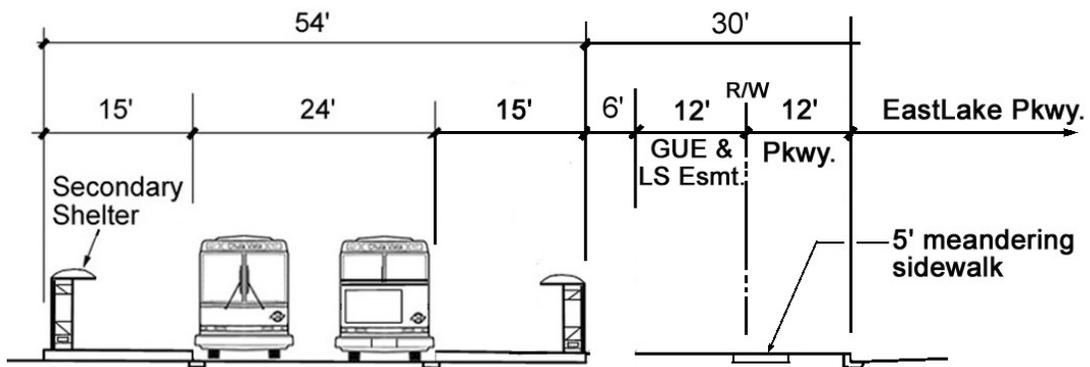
depicts a transit station concept which could be implemented at the proposed location. Similar to the pedestrian circulation design issue in general, the placement and design of these features will be a function of detailed design at the site plan level. The Conceptual Site Plan (Exhibit 6A & 6B) illustrates one site plan configuration integrating the transit facilities within the commercial center.
